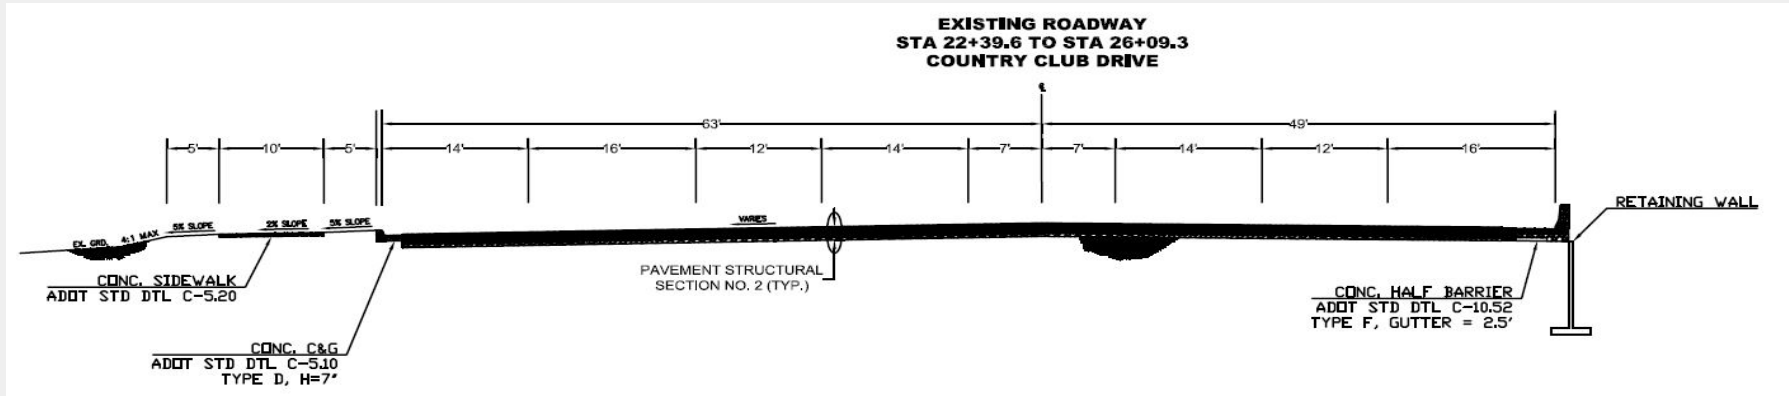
Country Club Drive Existing Cross-Section (NTS)
